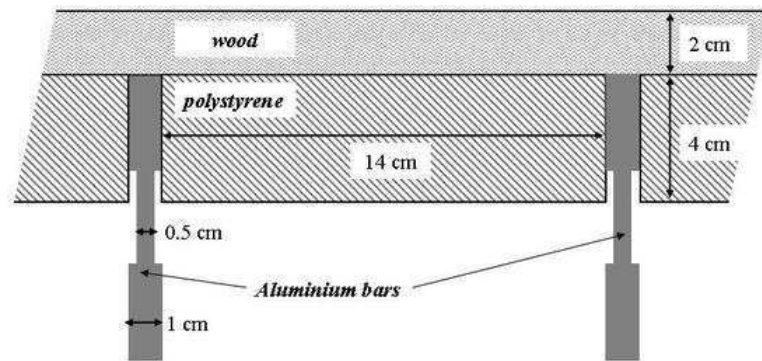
Drawing of lateral isolation interrupted by formwork reinforcements (ConCrack website 2010).
